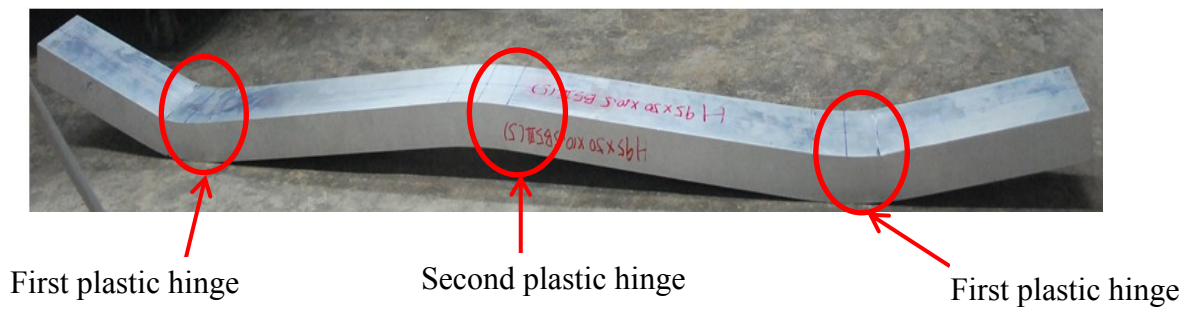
Large deflection of specimen (+N50×95×10.5B5II) before failure
